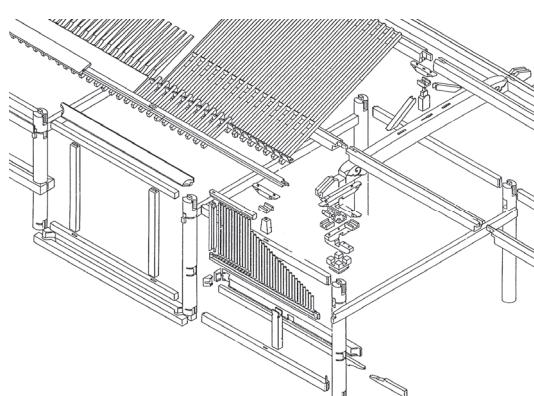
Typical set of components in the construction of a Japanese house (source: [10])
